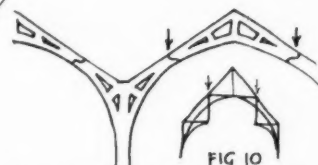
A GOTHIC MANNER OF BUILDING REVIVED IN REINFORCED CONCRETE. W.H. 1924.
